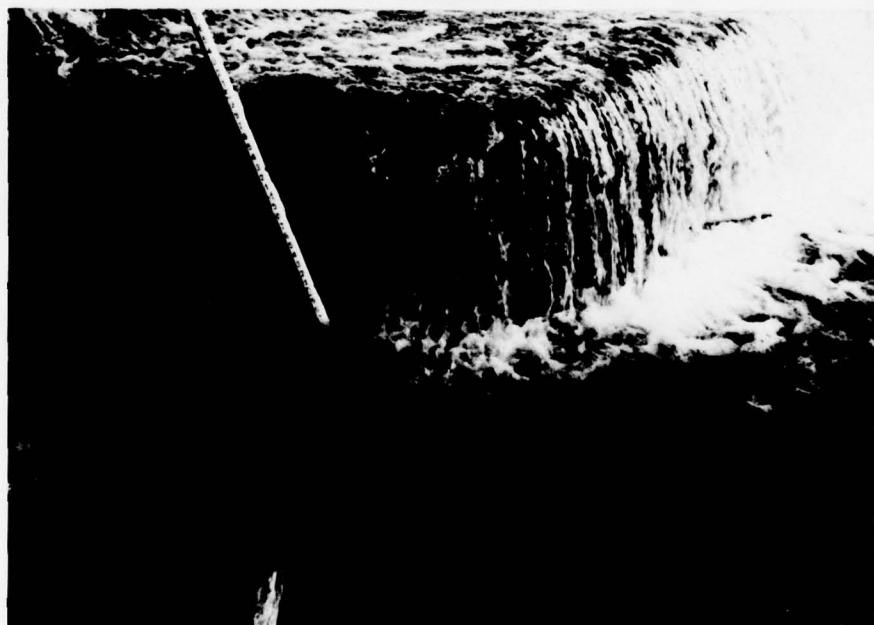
Detail of broken section of concrete at right toe of spillway.
